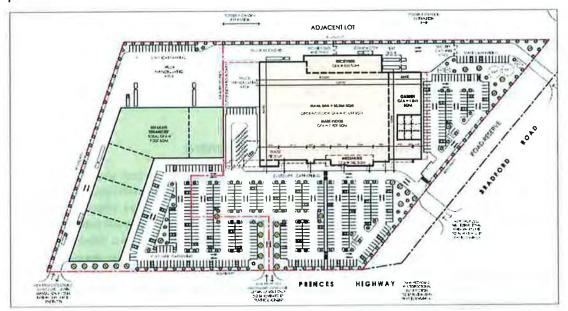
Proposed Development Layout (Supplied by Leffler Simes Architects, 2011)
